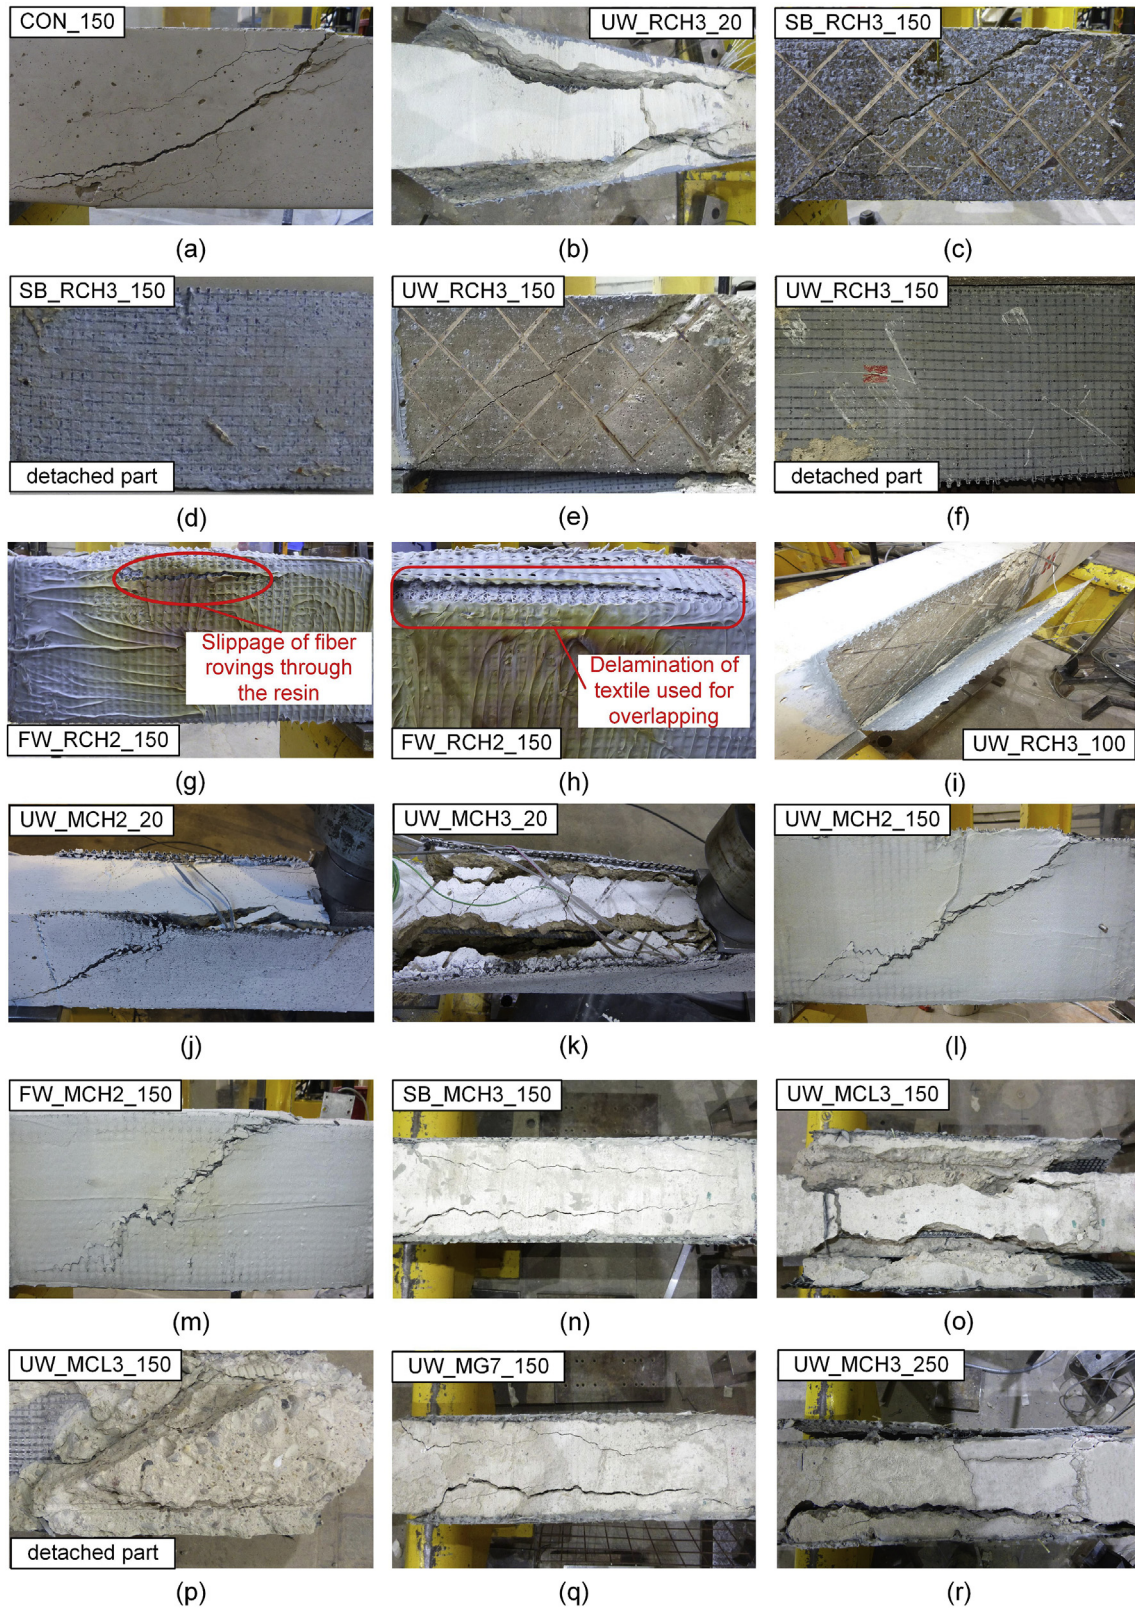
Failure modes of medium-scale rectangular beams: (a) CON_150 – dominant shear crack in specimen; (b) specimens UW_RCH3_20 – debonding of the jacket: peeling off of the concrete cover; (c)–(f) specimens SB_RCH3_150 and UW_RCH3_150 – adhesive failure at the resin-concrete interface; (g) specimen FW_RCH2_150 – slippage of the vertical fibre rovings through the epoxy resin; (h) specimen FW_RCH2_150 – delamination of textile used for overlapping; (i) specimen UW_RCH3_100 – adhesive failure at the resin-concrete interface; (j)–(k) specimens UW_MCH2_20 and UW_MCH3_20 – debonding of the jacket: peeling off of the concrete cover; (l)–(m) specimens UW_MCH2_150 and FW_MCH2_150 – local damage of the jacket; (n)–(r) specimens SB_MCH3_150, UW_MCL3_150, UW_MG7_150 and UW_MCH3_250 – debonding of the jacket: peeling off of the concrete cover.
